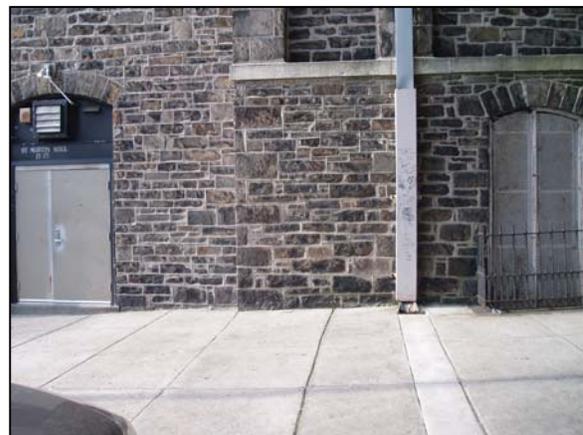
Proposed location of the stormwater planter, along the building between the window and corner (to the right of the door).
